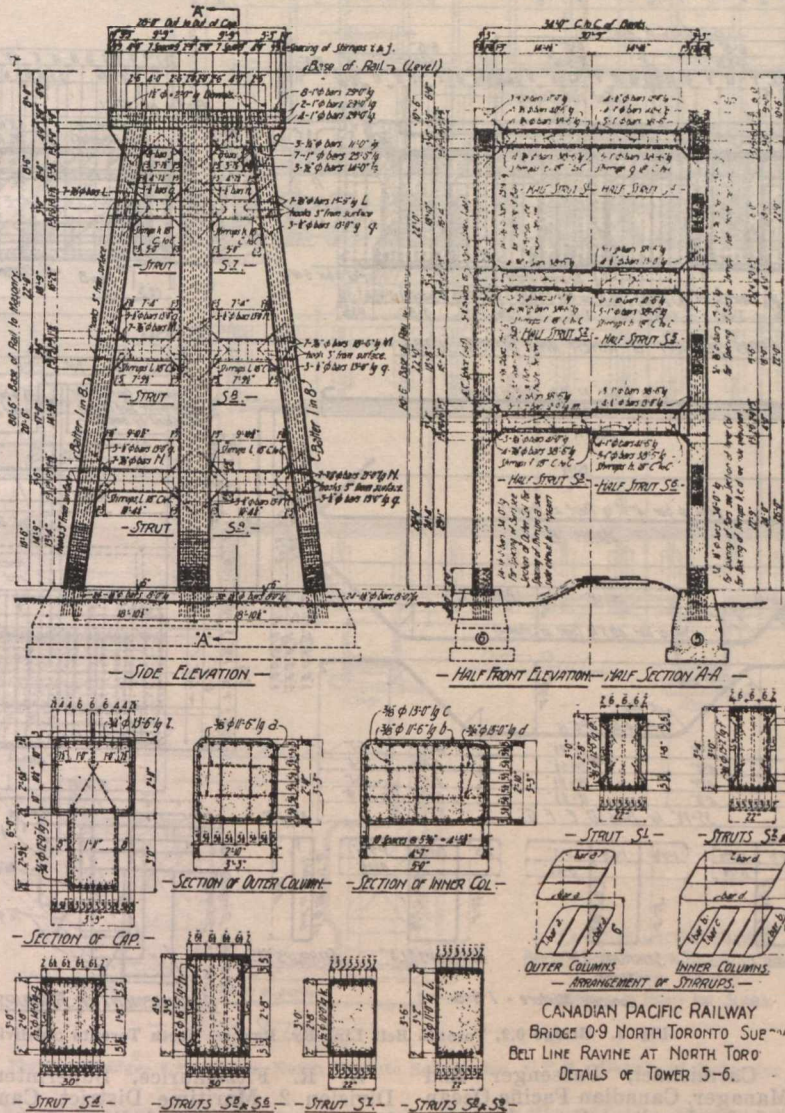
Bridge 0.9, Toronto Belt Line Ry. Ravine, North Toronto Subdivision, C.P.R. Details of tower 5-6
